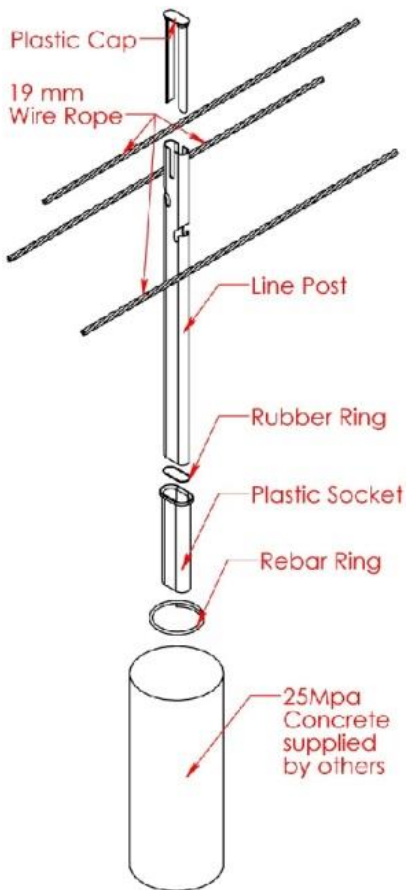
Armorwire Cable Barrier Line Post Assembly [63]
